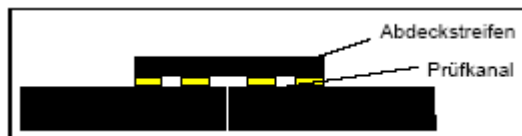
extrusion coating joint for welding the Ekoliners.
